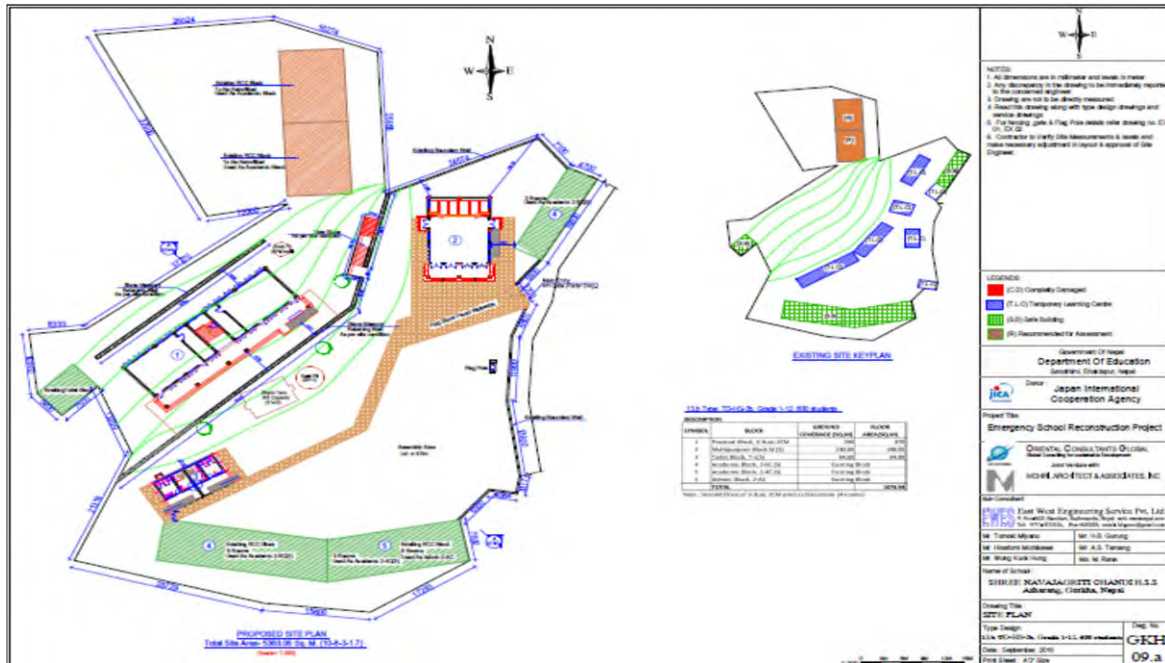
Revised Site Plan 29<sup>th</sup> Dec. 2016
